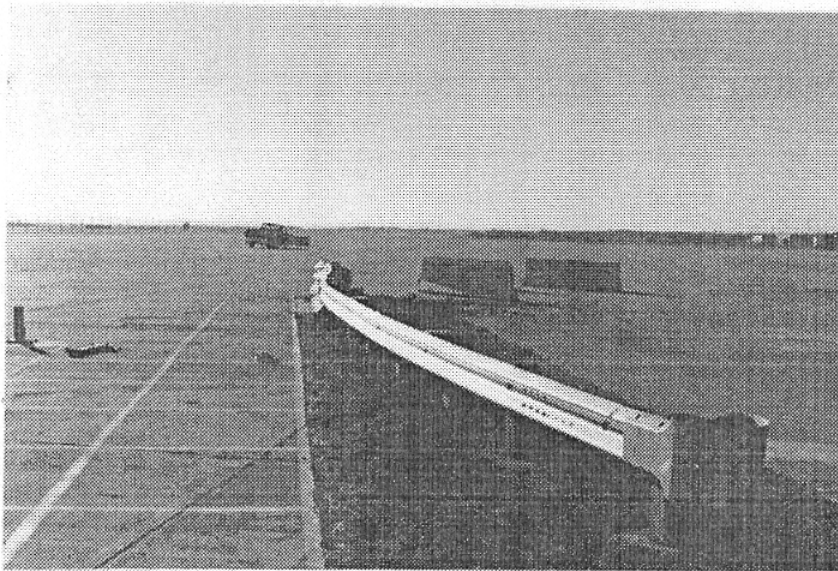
PHOTOGRAPHS OF DAMAGE TO APPROACH GUARDRAIL TRANSITION SECTION.
